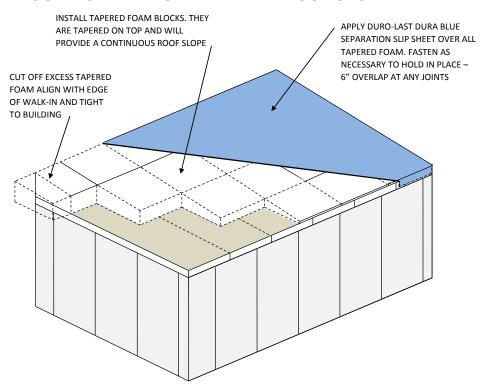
TAPERED ROOF SYSTEM; TAPERED BLOCKS AND DURO-LAST DURO BLUE SEPARATION SLIP SHEET
